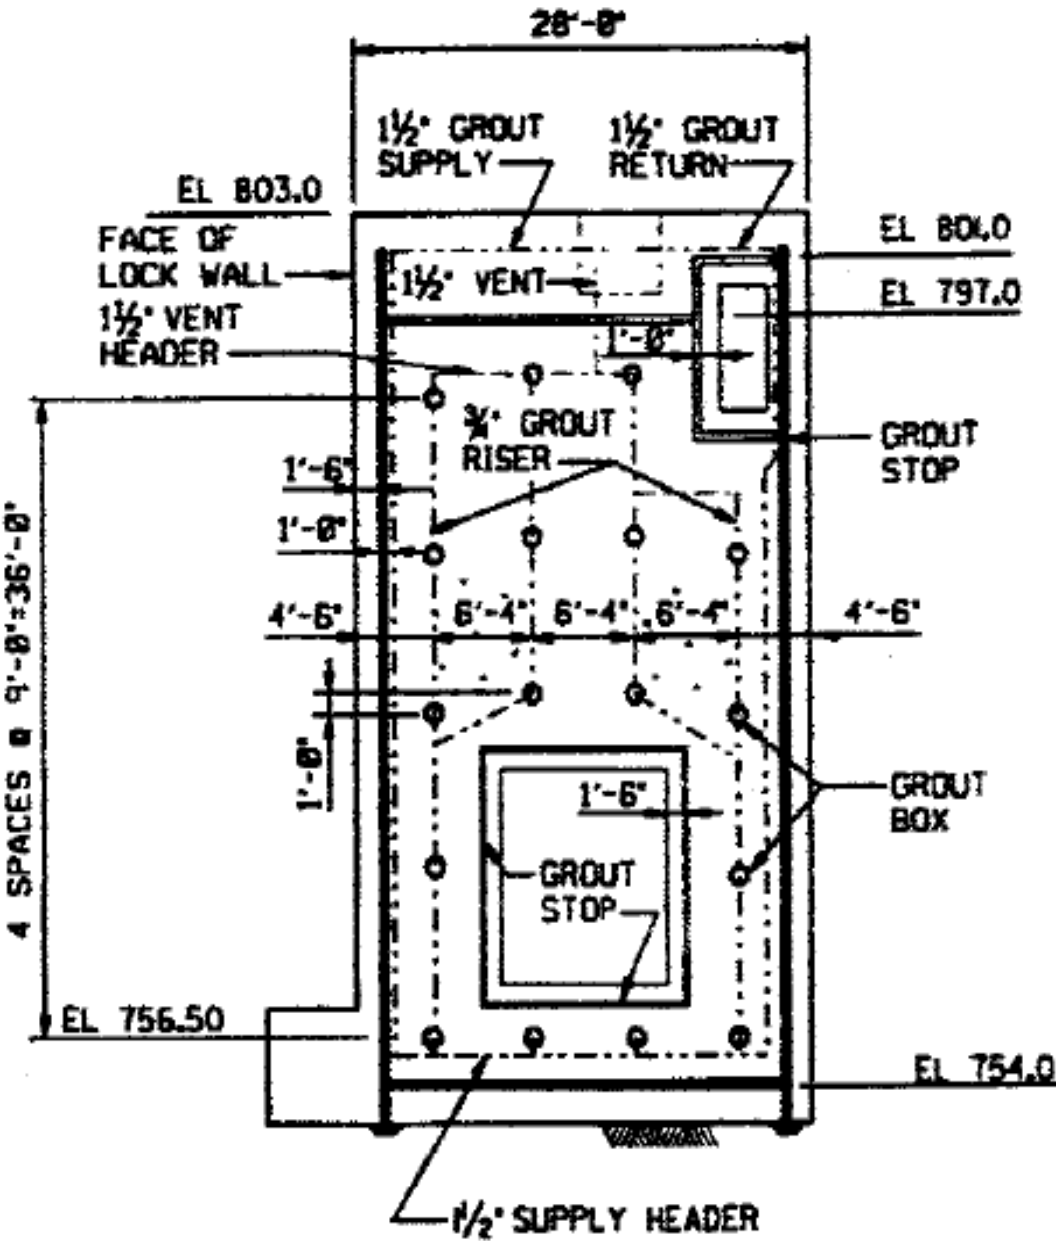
Typical grout piping system for a lock wall monolith joint.
